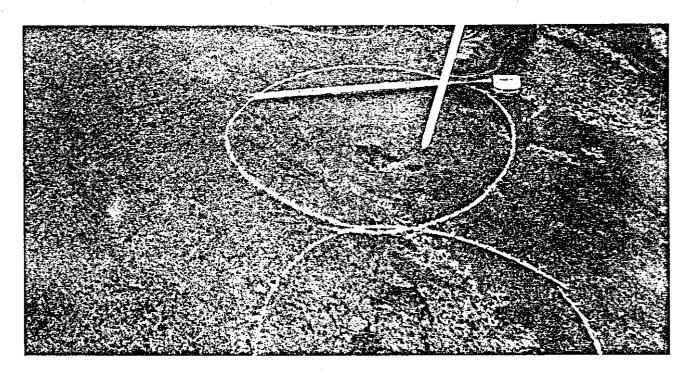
SECTION 4 WITH CTB AFTER TWO WEEKS SATURATION AND 2,440,000 LOADS.
